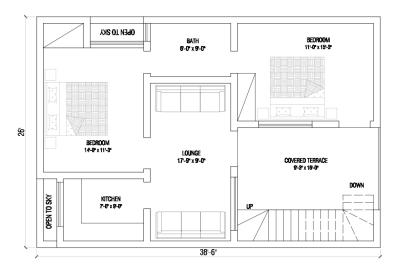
A Modern House's Basic Layout (First Floor Plan)
